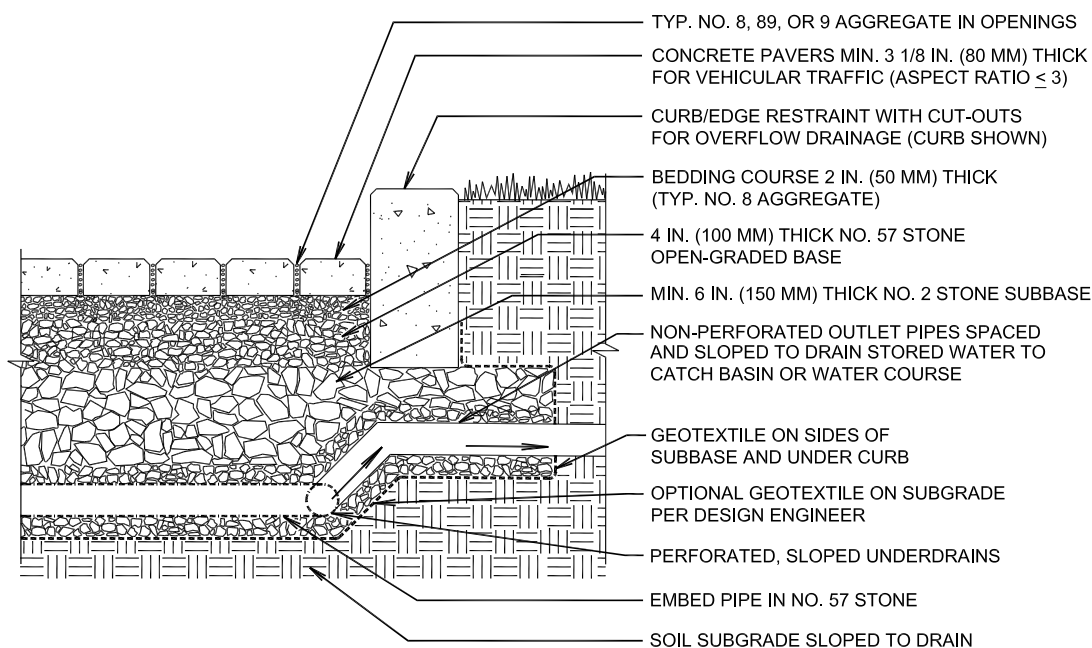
Typical cast-in-place concrete curb sits on the ASTM No. 2 stone subbase. Note that the ASTM No. 2 stone requires geotextile along its sides to prevent migration of soil into it.
